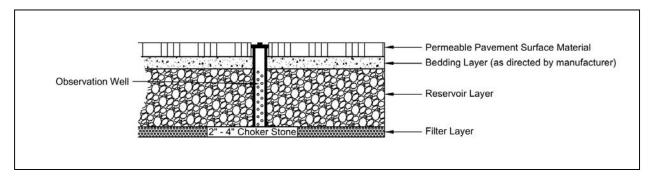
Cross-section of an enhanced permeable pavement design without an underdrain.
